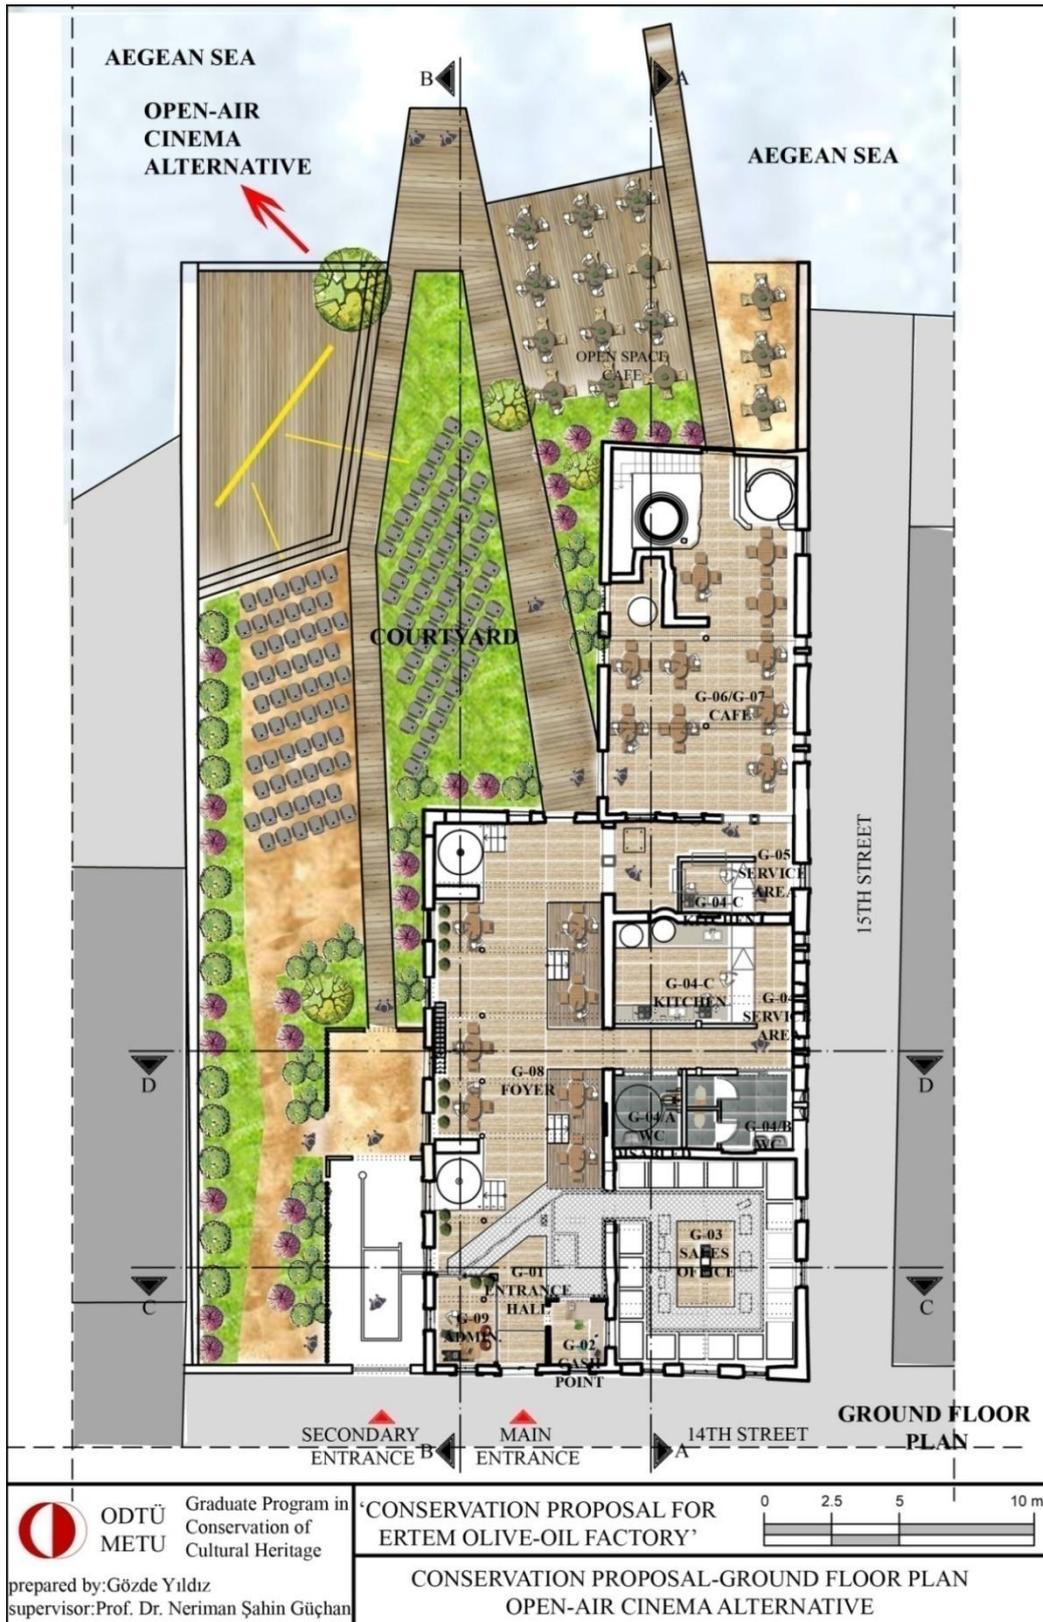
Conservation Proposal, ground floor plan, alternative-2 for the courtyard
